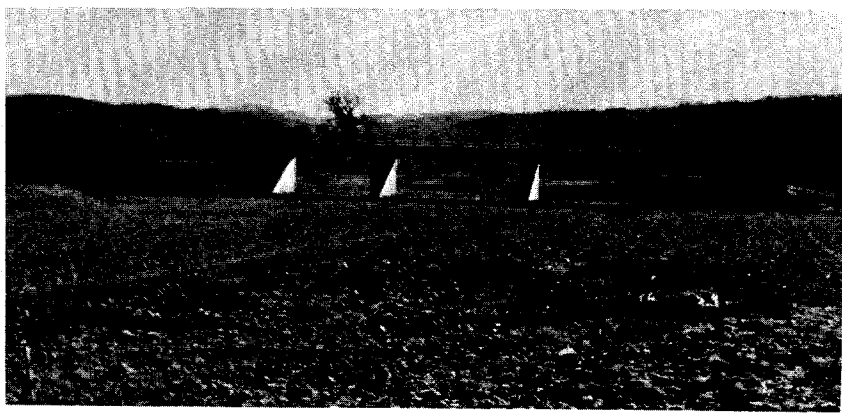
Downstream view of Salmon Creek bridge built in 1975. (From U.S. Forest Service.)
